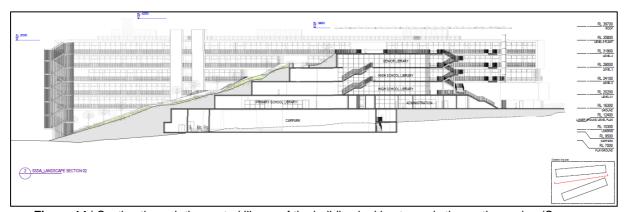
| Section through the central library of the building looking towards the northern wing (Source: Applicant's RRAI 2020)
